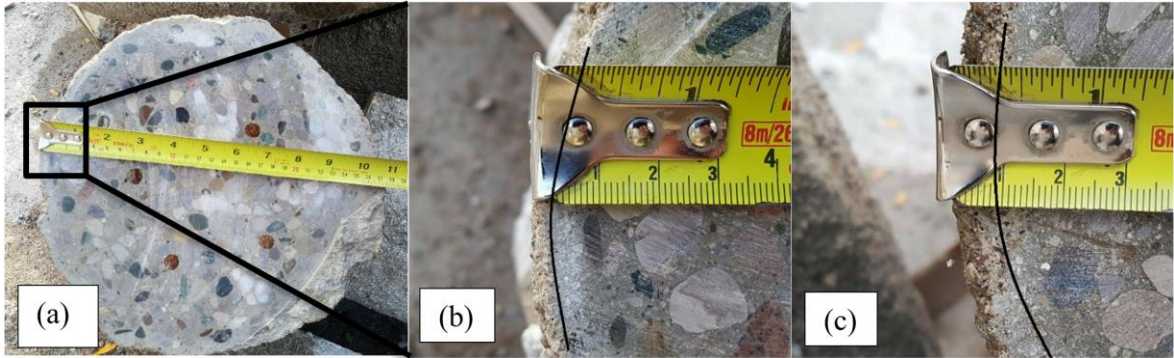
Pile sand cover intrusion (a) pile cross section, (b) bored pile, (c) CFA pile
